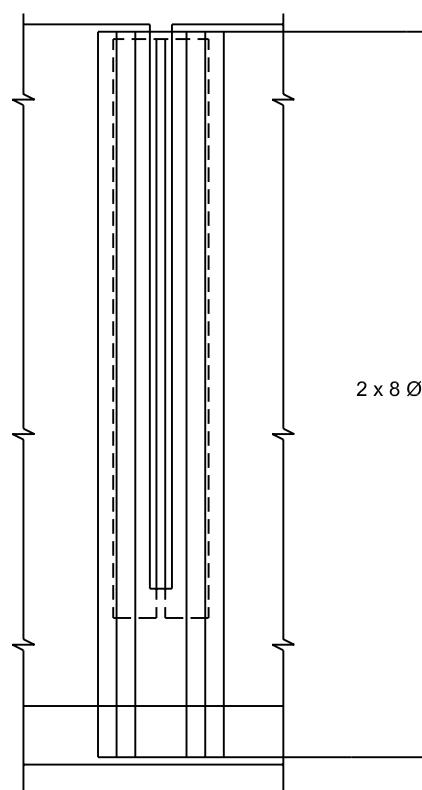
EXPANSION JOINT - DETAILS
